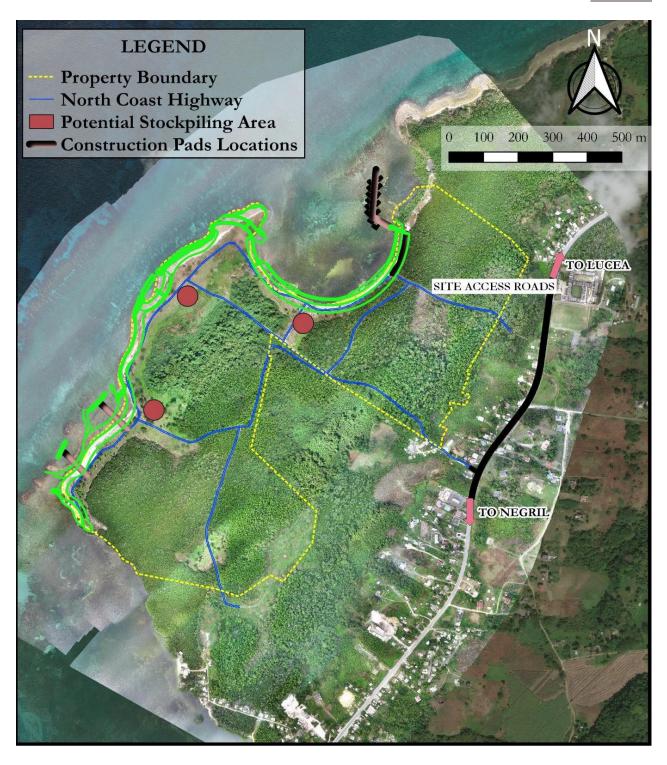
Construction Layout showing material stockpiling areas on site and construction pad location (for searooms)
